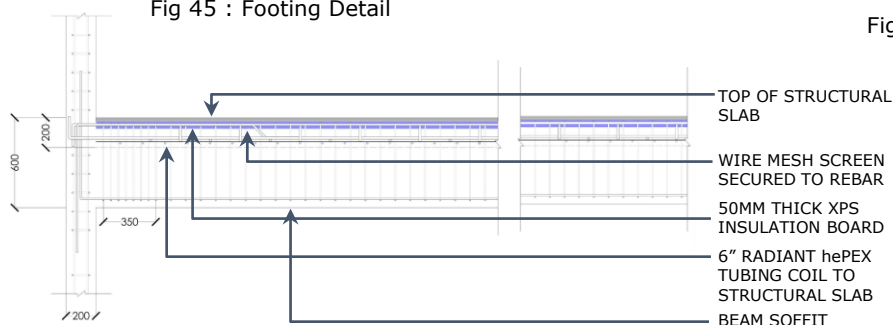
Detail of Radiant Cooling integrated in Structural Slab
